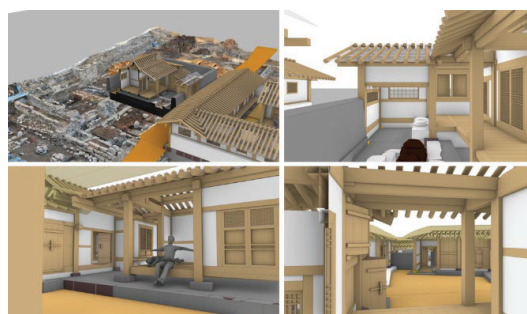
Examples of Reconstructed Elevation and Interior Space.
